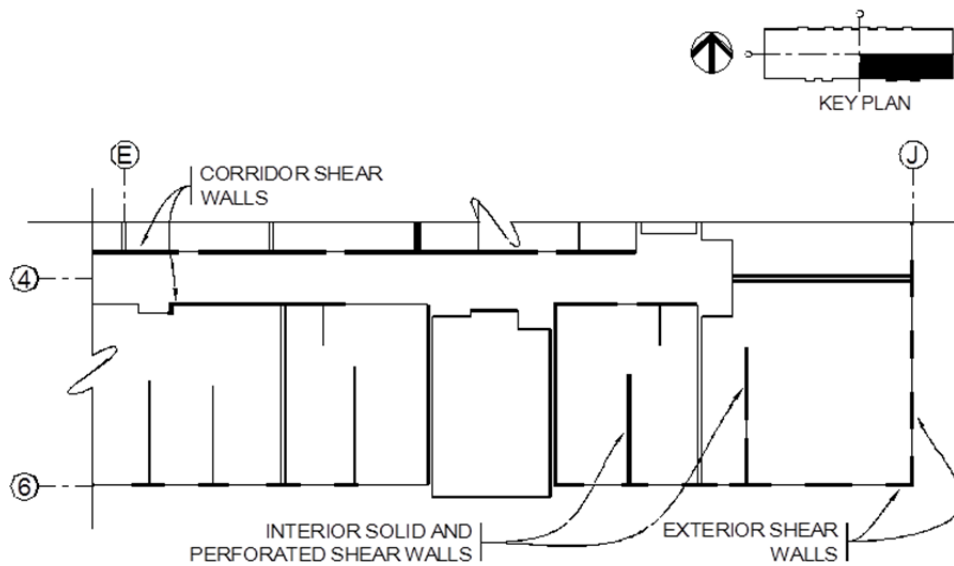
Plan of shear walls (southeast corner) for current national seismic code design.
